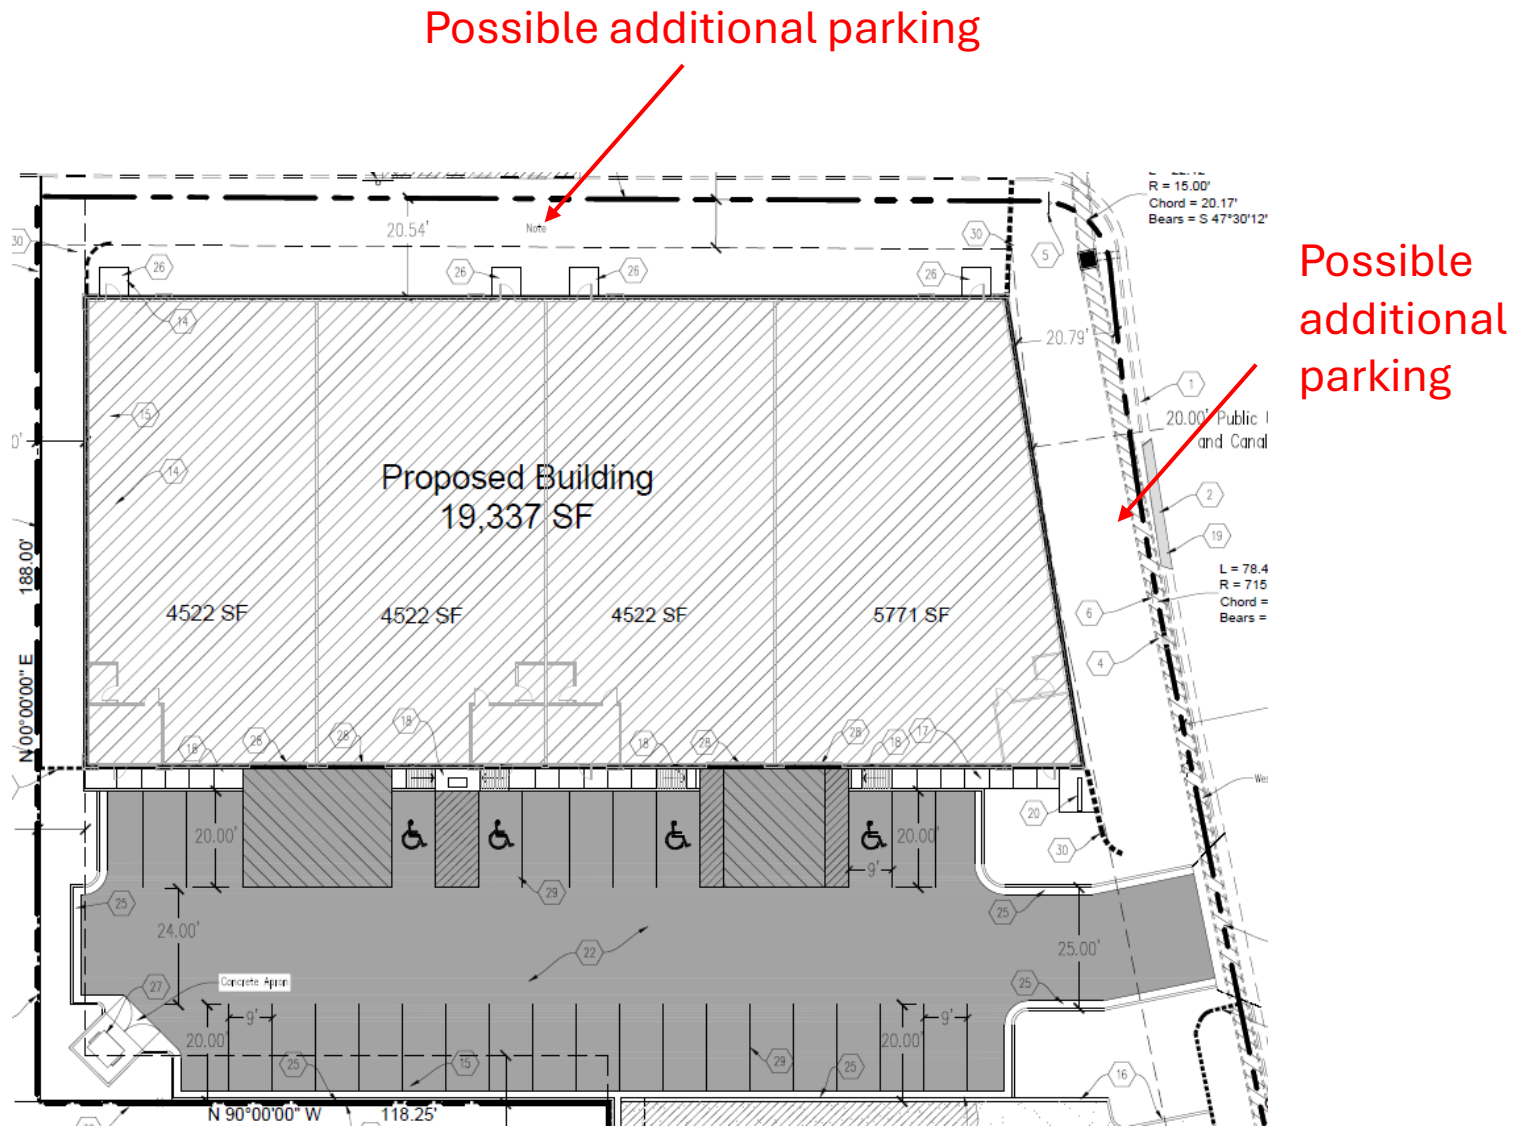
Images demonstrating proposed location for off-street parking and examples of adjacent/nearby businesses using similar parking. This solution would also provide sufficient parking to address needs for the interior buildout
